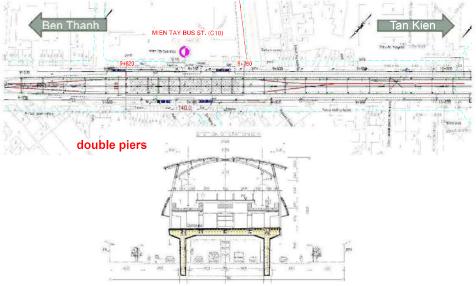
Plan and Profile at C10 Proposed by the JST
